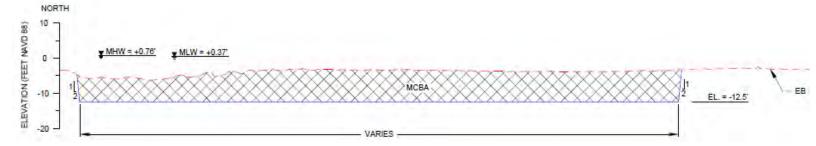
Marsh Creation Borrow Area Typical Cross Section
